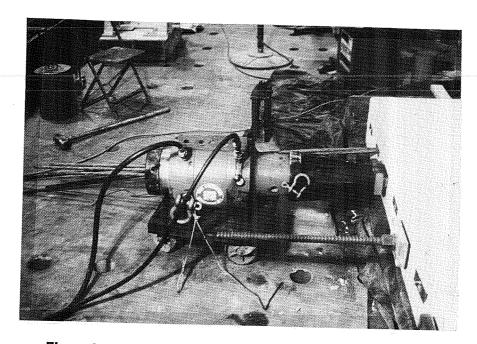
Hydraulic Ram Loading Anchor With Steel Strands
